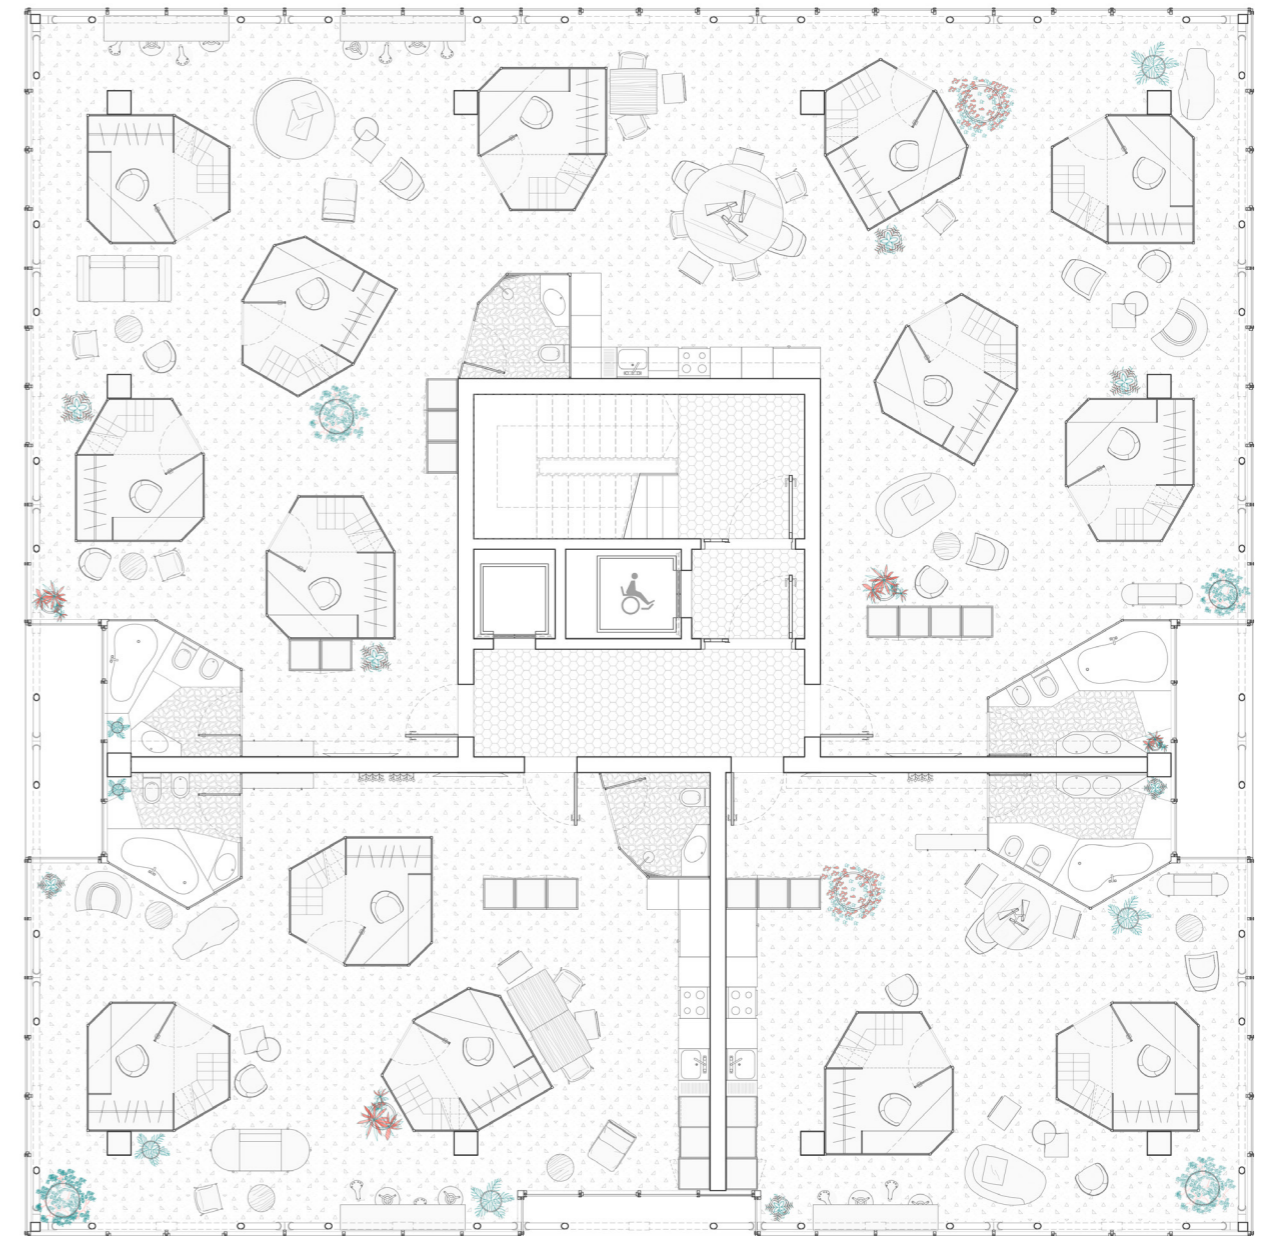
Type 4 - Dwelling Units Floor Plan, variation 1 (levels 17-18)
